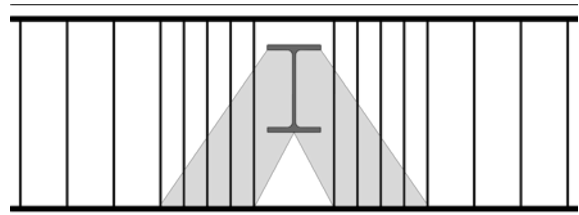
Arrangement of reinforcement for the indirect support of a steel beam inside a concrete beam.
